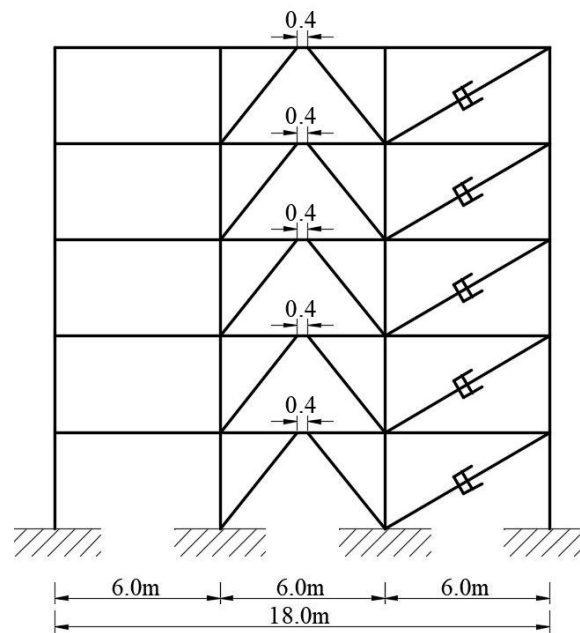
Elevation view of a perimeter dual frame equipped with fluid viscous dampers
